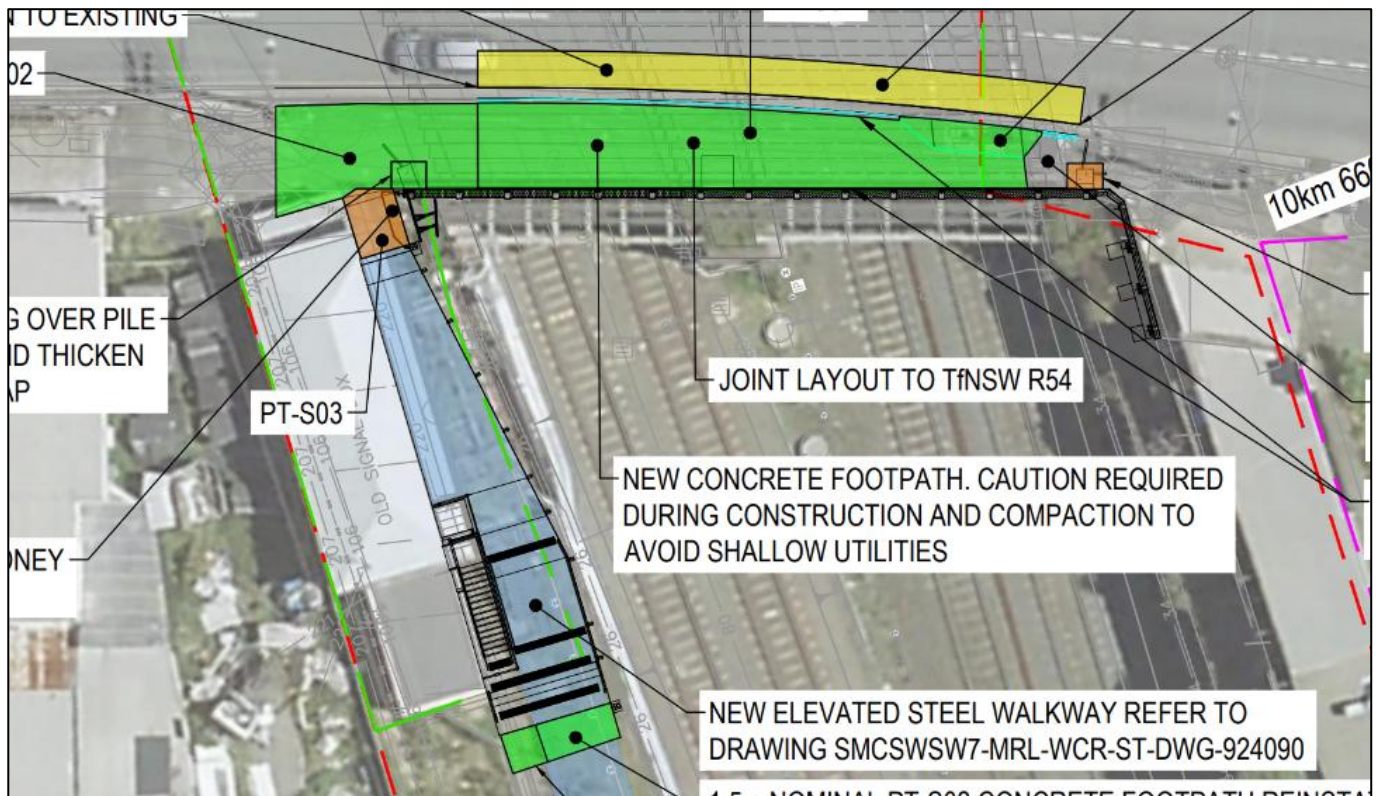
Plan of the location for the proposed replacement staircase (Source: Aurecon, 2025)
